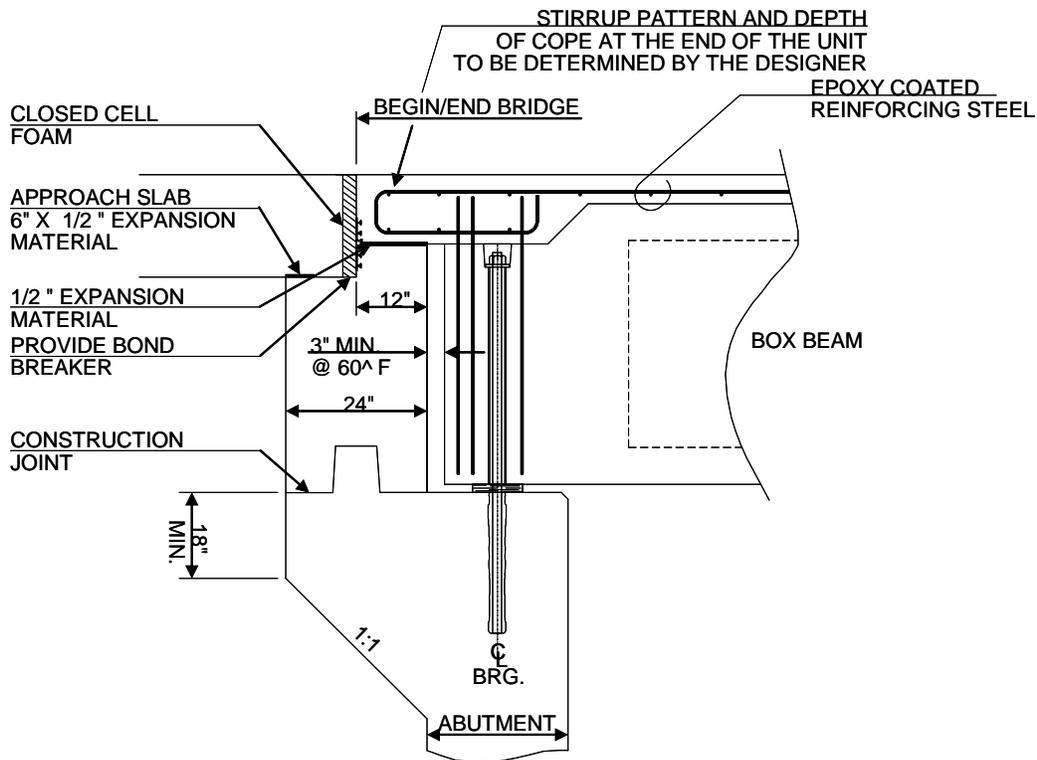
1 Box Beam Type H Bridge End Detail
